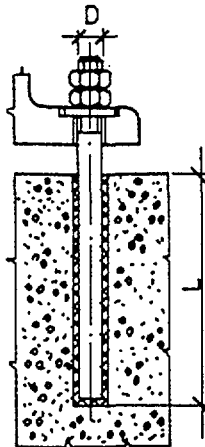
Anchor Bolts Grouted in Drilled-in-Place Small Size Holes
